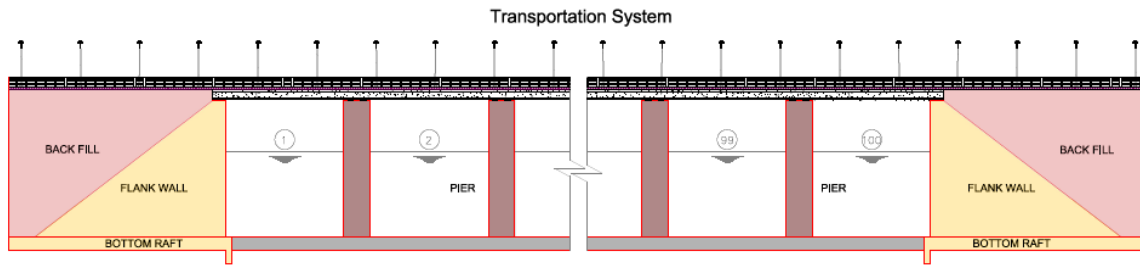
Longitudinal Section of Flood Regulator at flank wall
